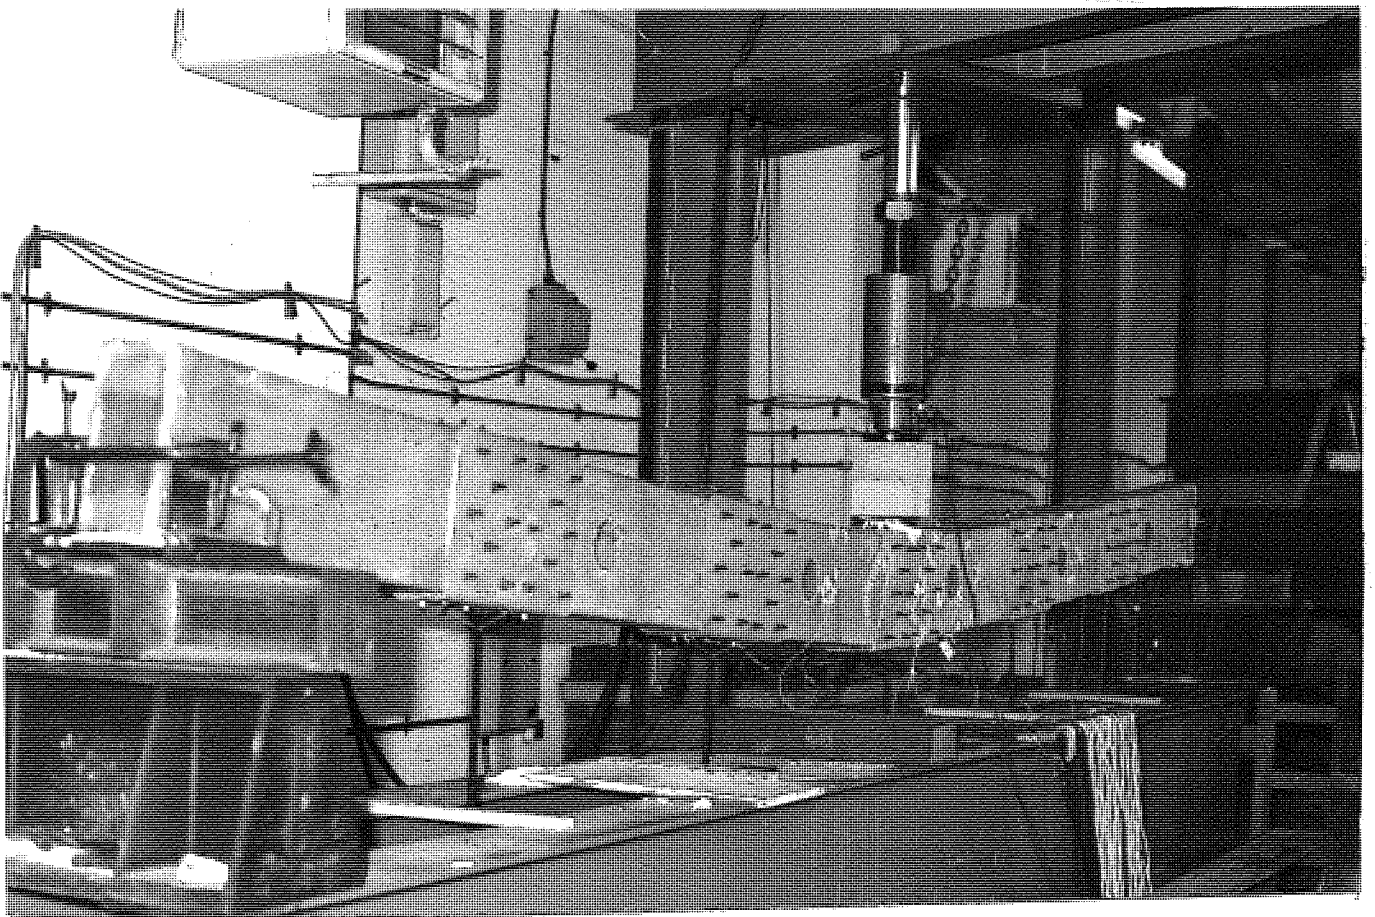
MULTIPLE JOINTED BEAM TUPE C10 MODE OF FAILURE
